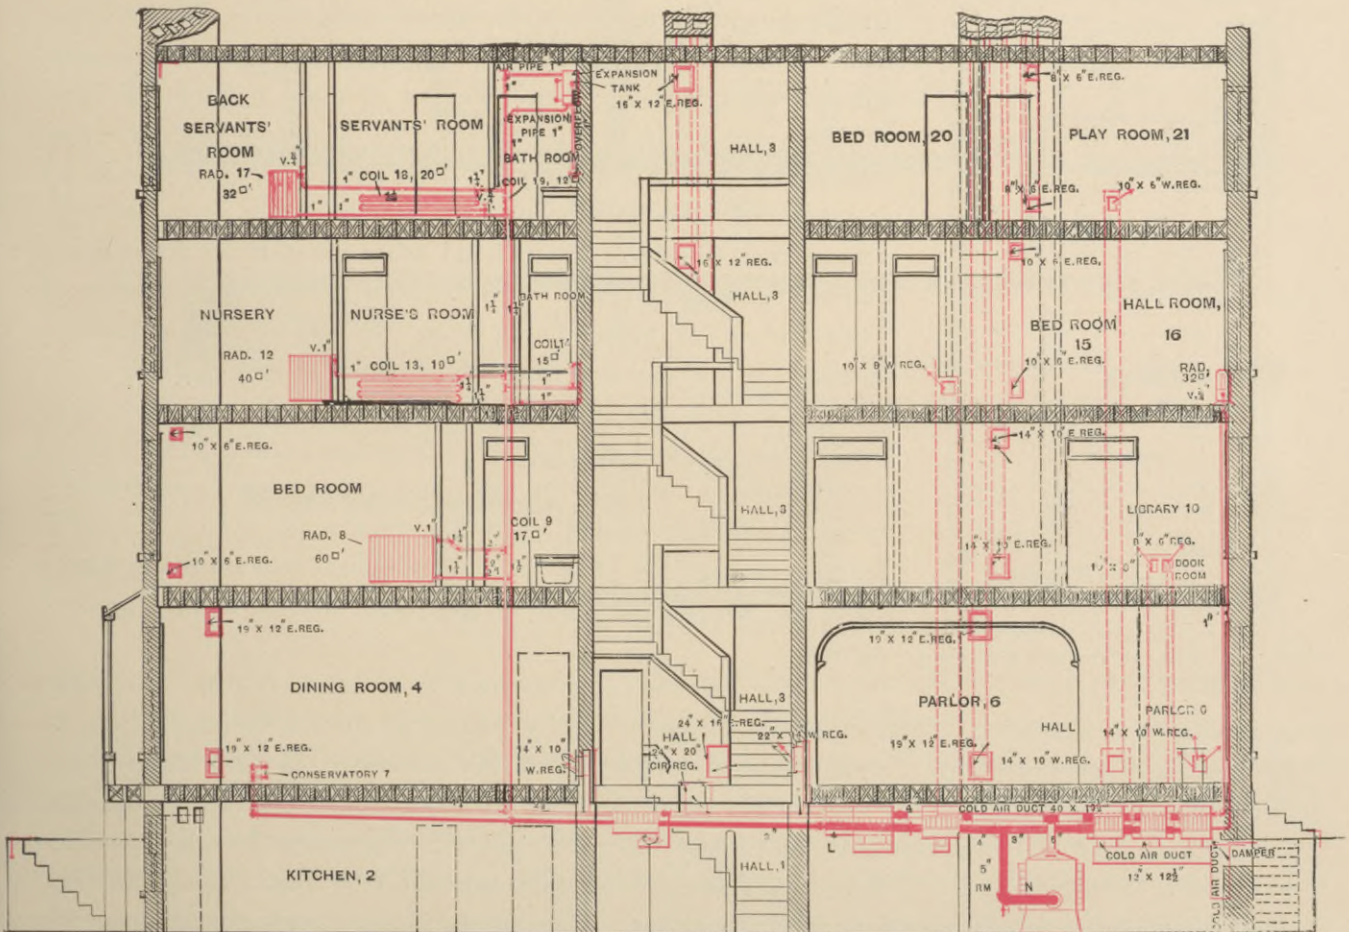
Sectional Longitudinal Elevation of City Residence. Scale  $\frac{1}{2}$  inch to the foot.
